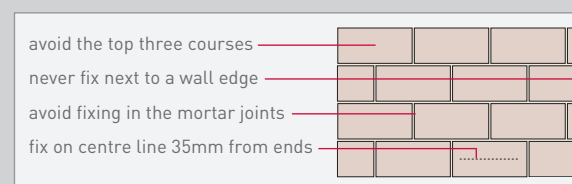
is a useful indicator of where to locate fixings within a blockwork wall. It may be used at the design stage, during construction, as well as after the building has been occupied.
